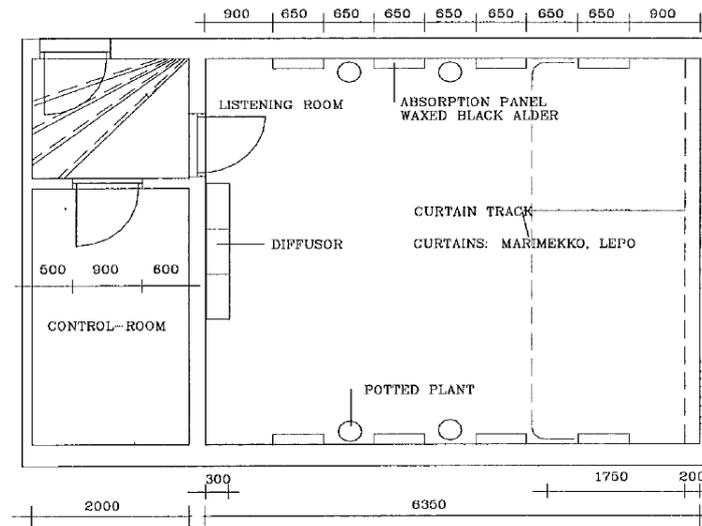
Floor plan of the HUT listening room and control room [5]
